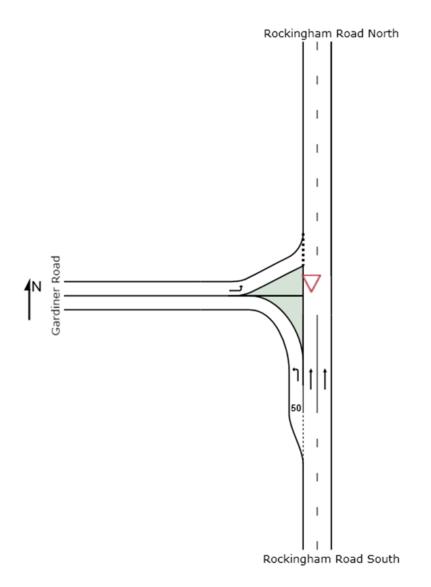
SIDRA intersection, Rockingham Road and Gardiner Road
